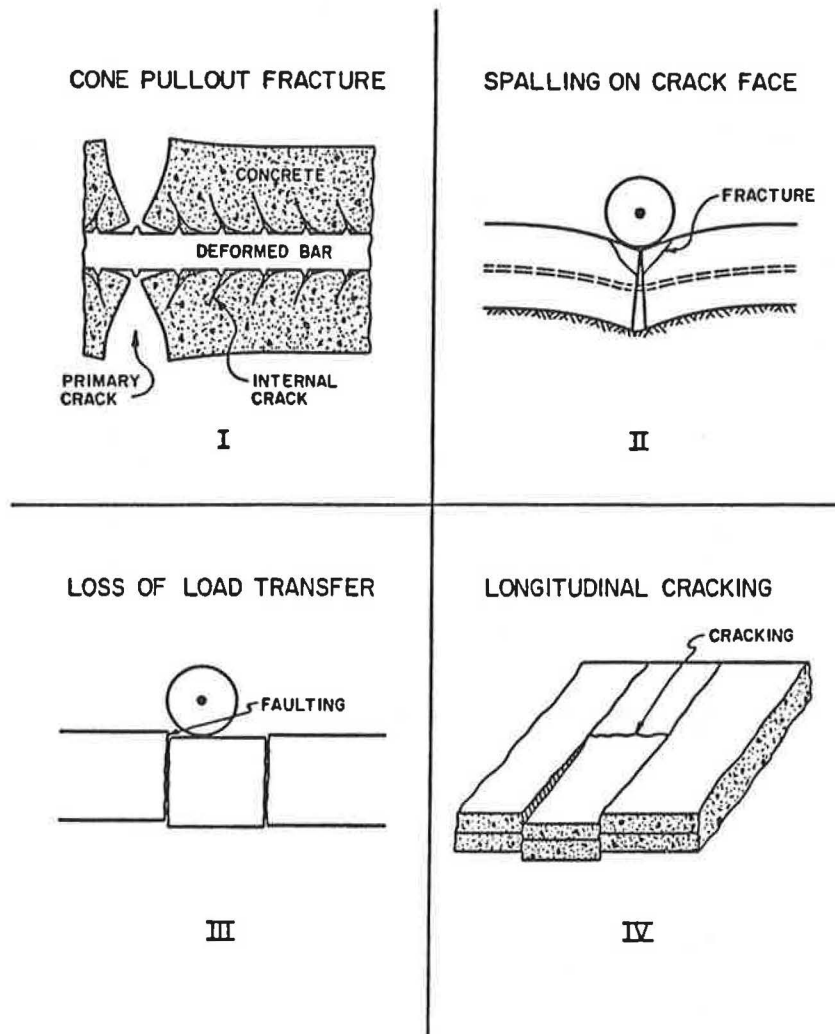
Failure modes related to punchout distress in CRC pavement.
